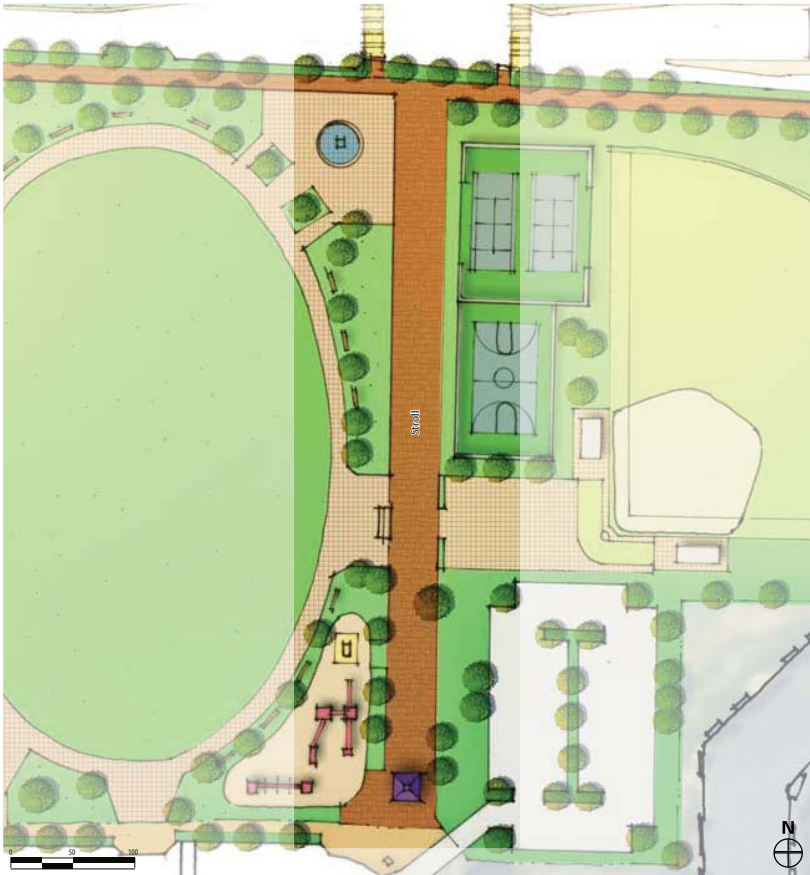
PLAN DETAIL AND EXAMPE IMAGES FOR THE STROLL
